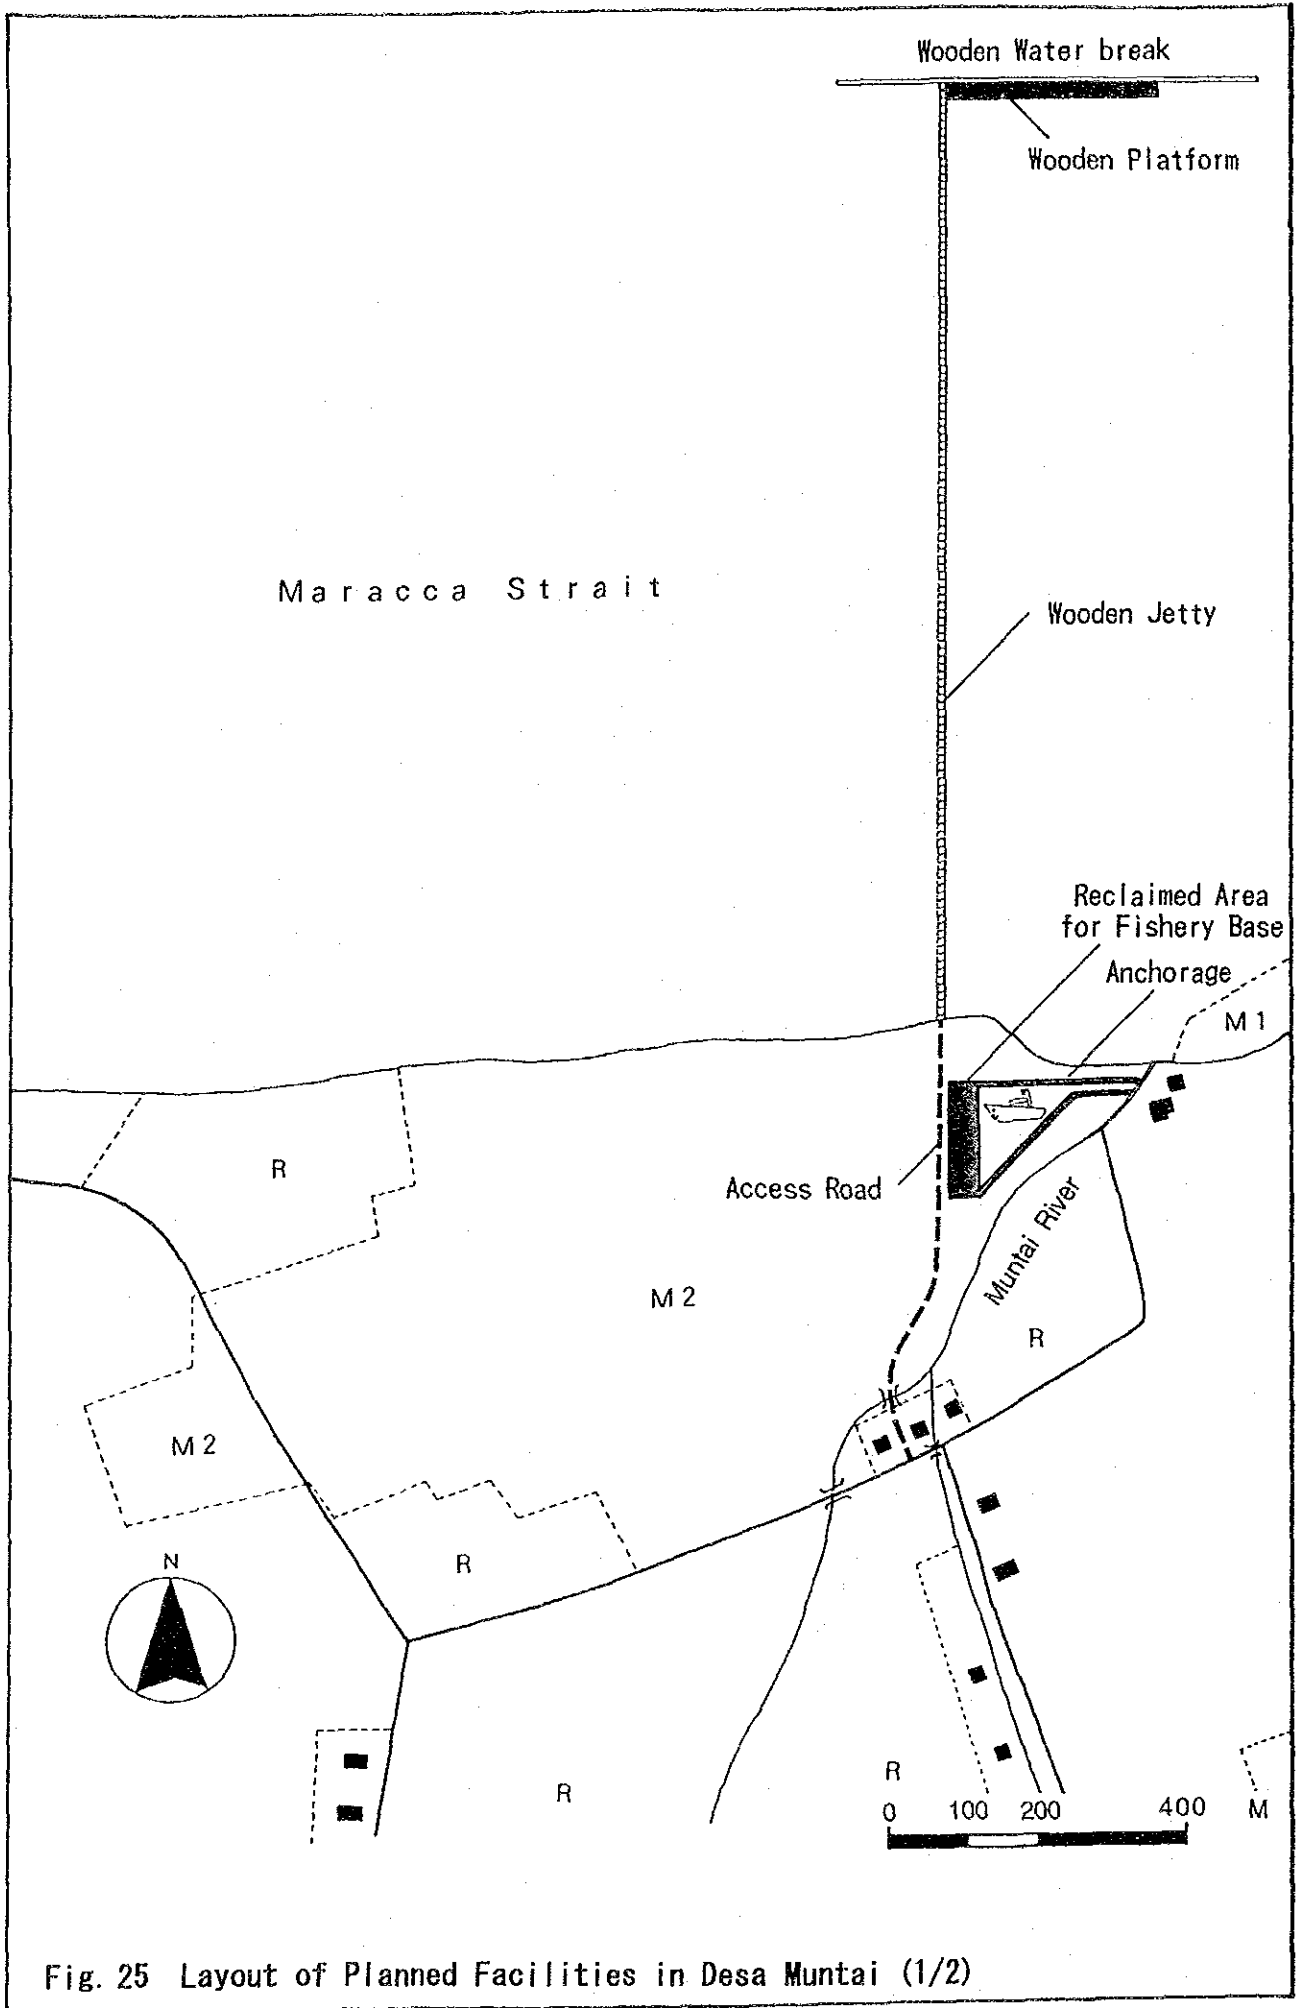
Layout of Planned Facilities in Desa Muntai (1/2)
